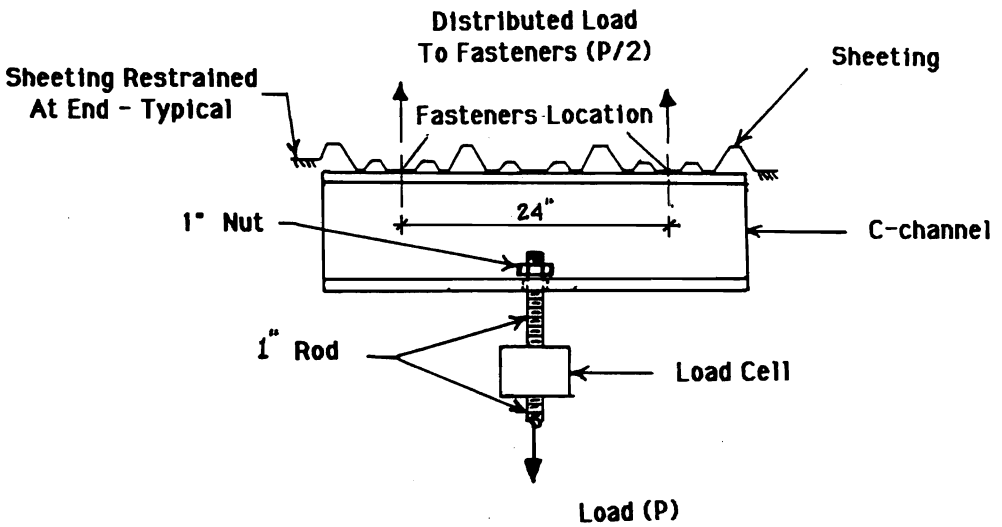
LOAD APPLICATION TO THE TEST SPECIMEN
